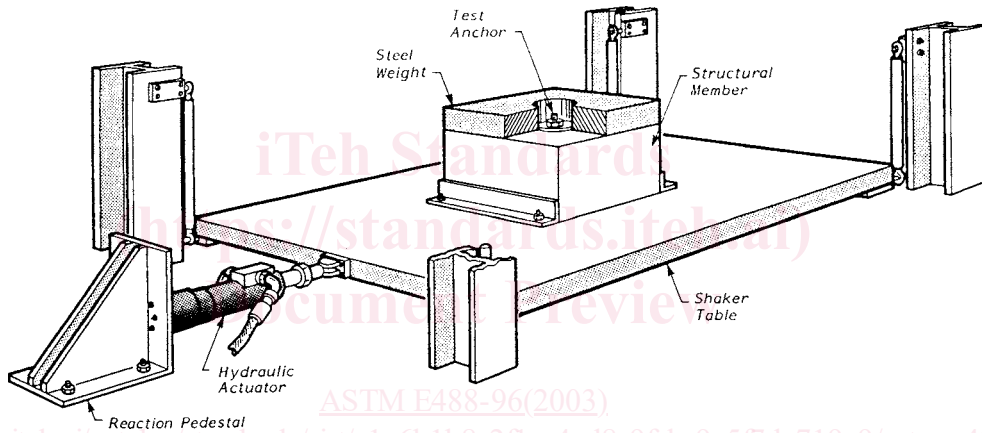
Typical Seismic Shear Test Arrangement—Indirect Loading Method
